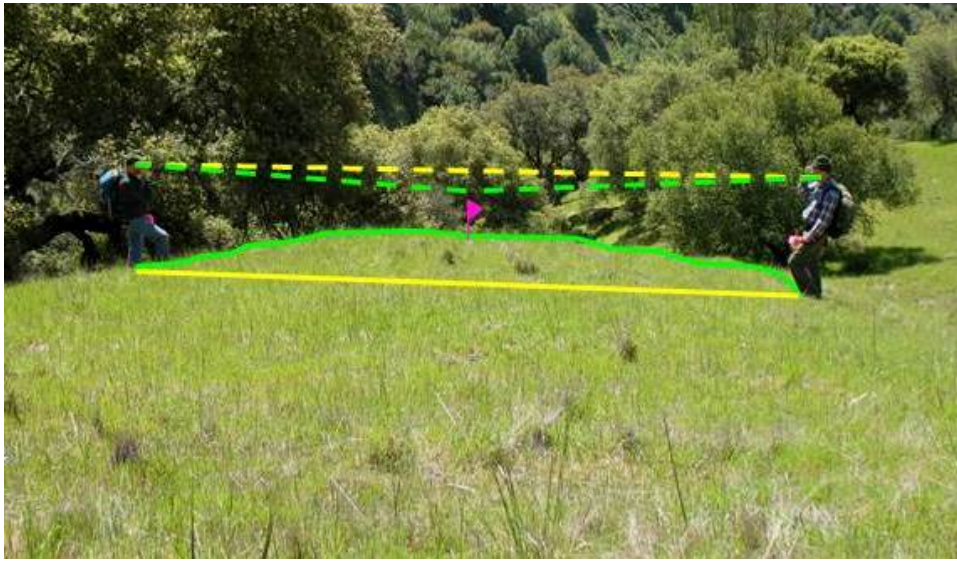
illustrates how, following traditional construction practices, a trail constructed on a 30% hillslope would be half native bench and half fill bench (yellow line). However, by constructing further into the hillslope the entire trail bed is comprised of native material (red line).
